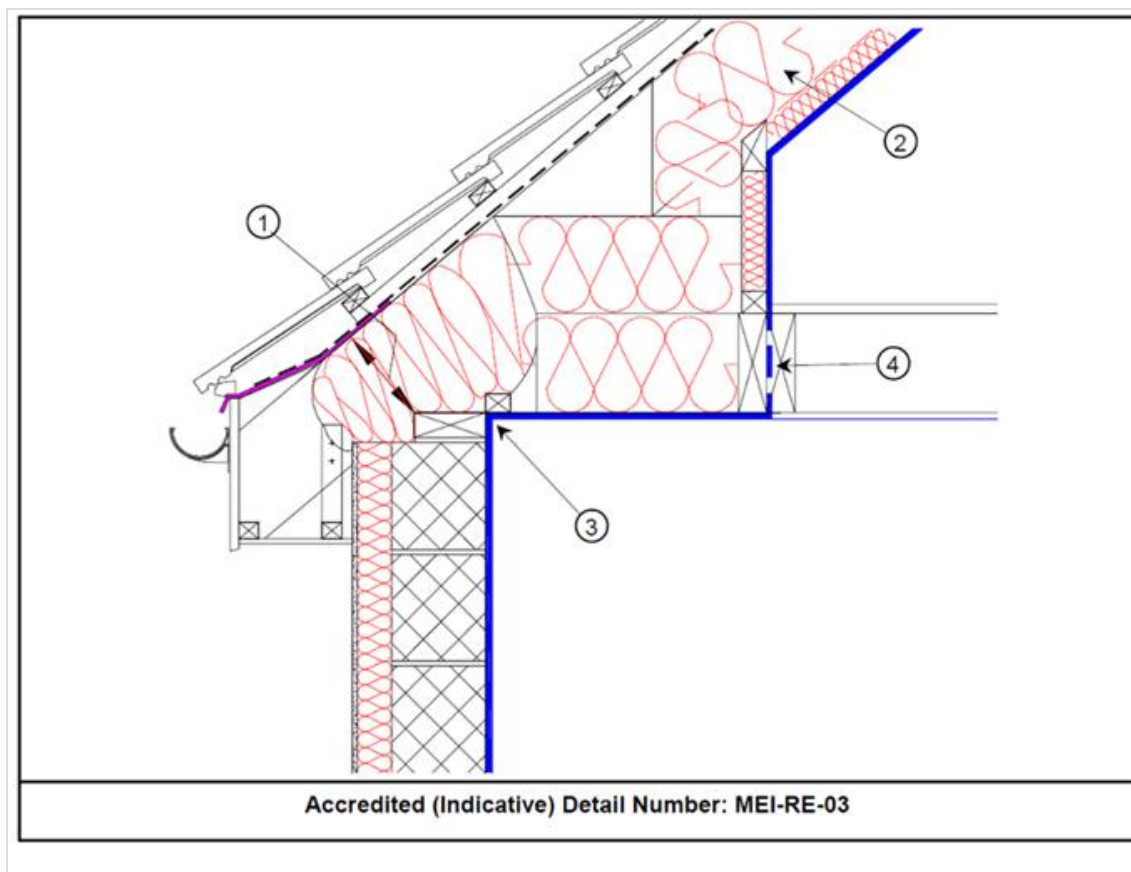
Illustration from ACD for Pitched Roof. Extracted from ACDs for Masonry External Wall Insulation.
